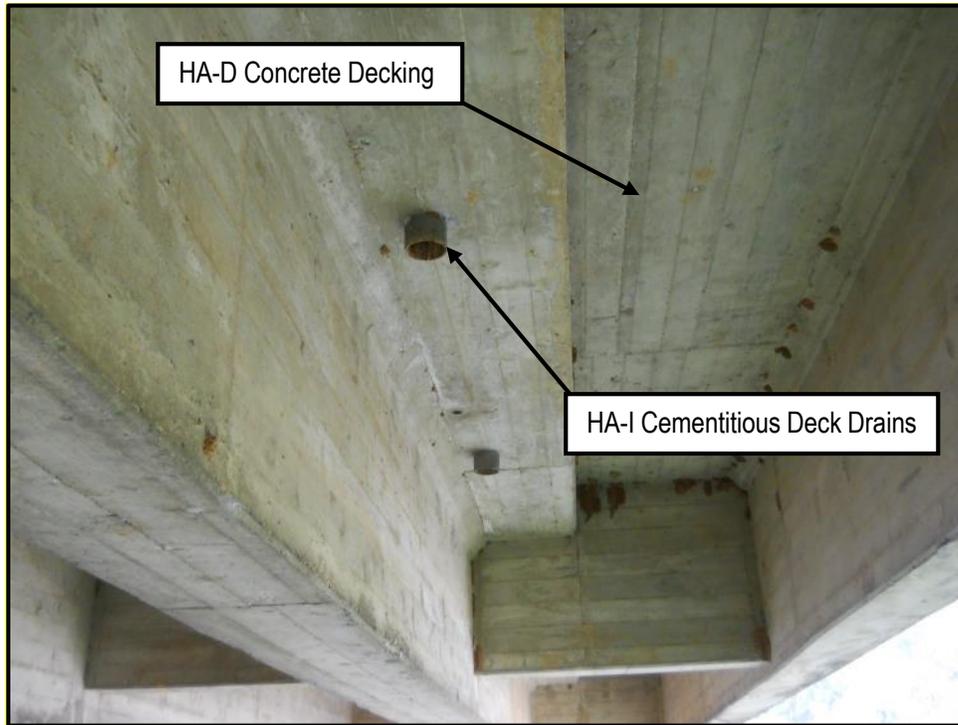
View of HA-D and HA-I from below the SR-16 Bridge over Boiling Fork Creek
